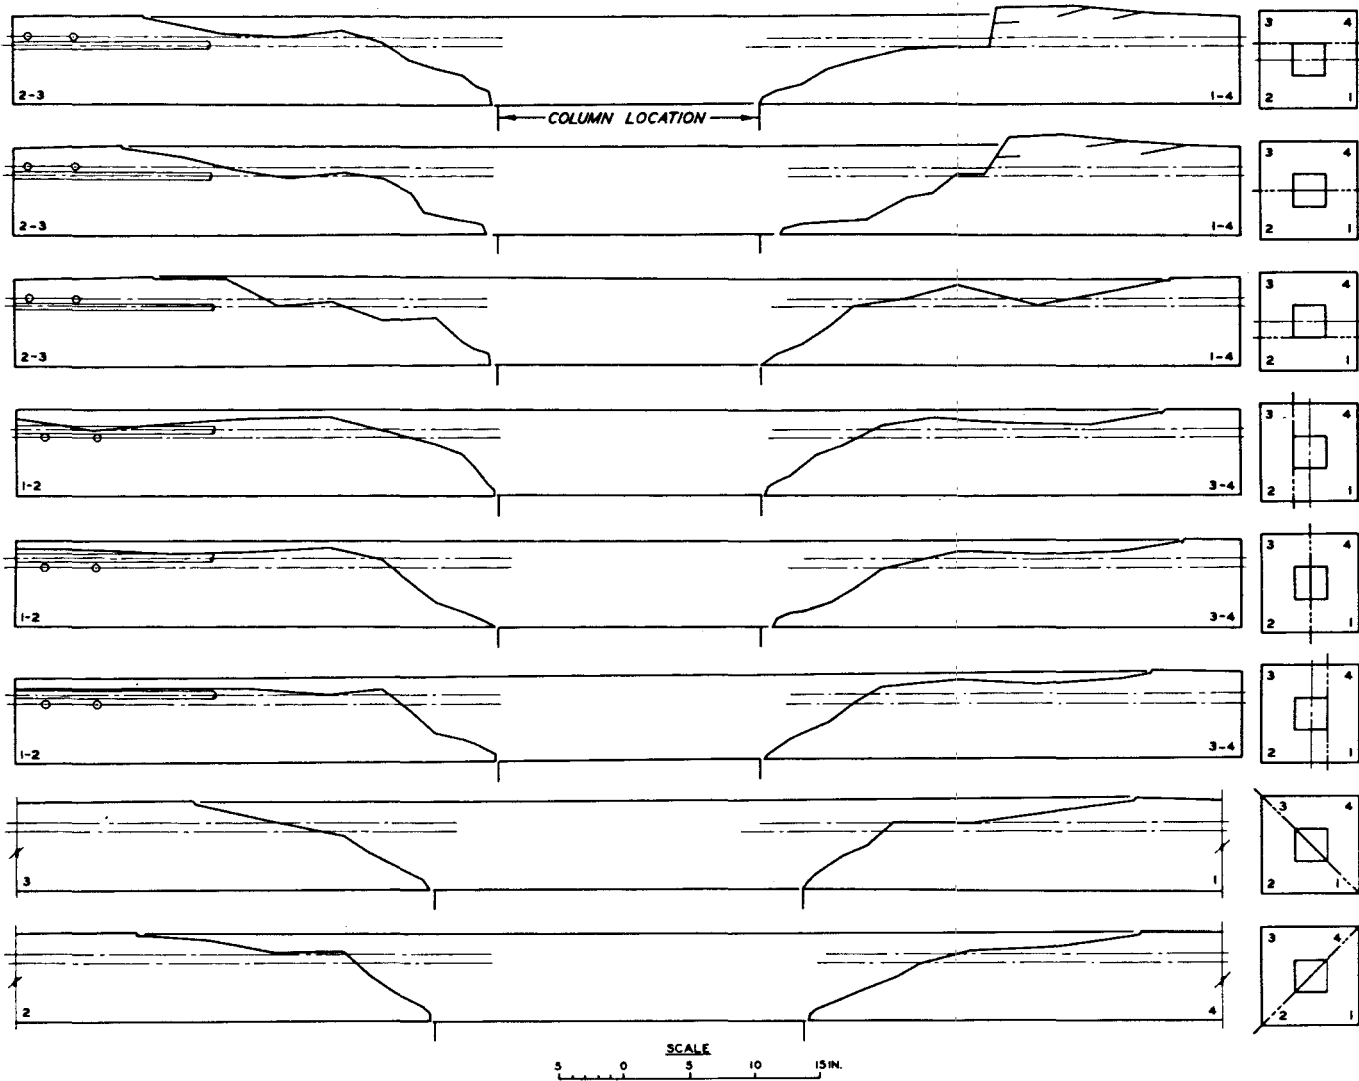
Profiles of slab failure surface, Specimen D4150-2.
